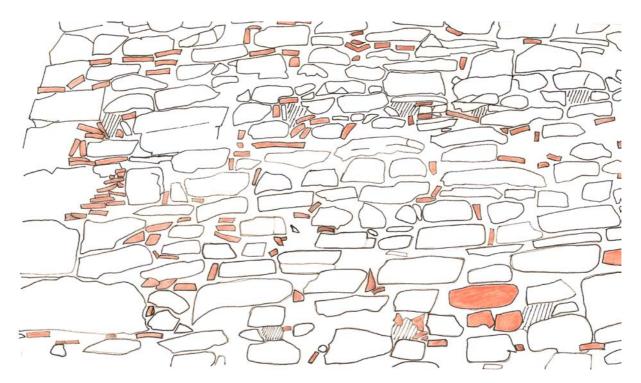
Angelokastro, SW building. Drawing of a section of masonry on the W façade.
